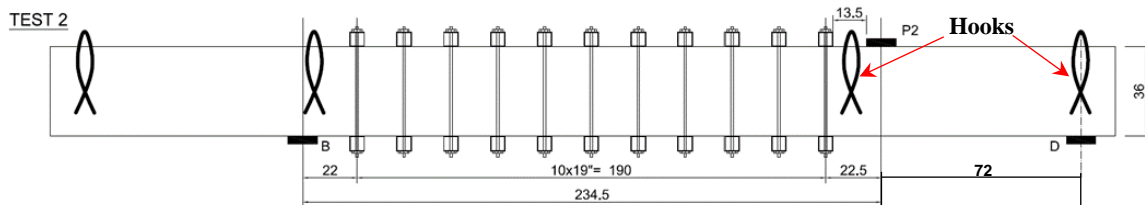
Girder 2-Test 2 configuration (dimensions in inches)
